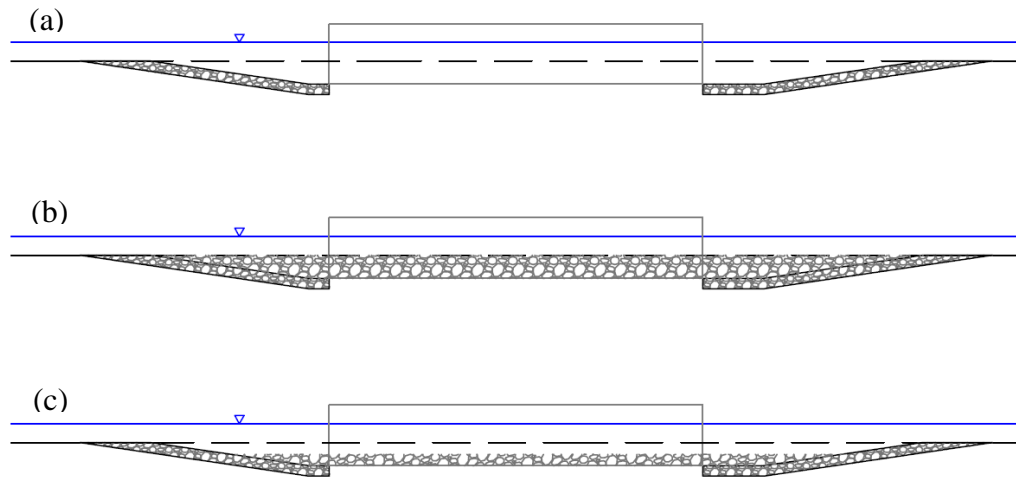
Schematic illustrations of culvert embedment types: (a) embedded without backfill, (b) embedded with backfill elevation equal to stream bed elevation, and (c) embedded with backfill elevation less than stream bed elevation (Alberta Transportation 2001).
